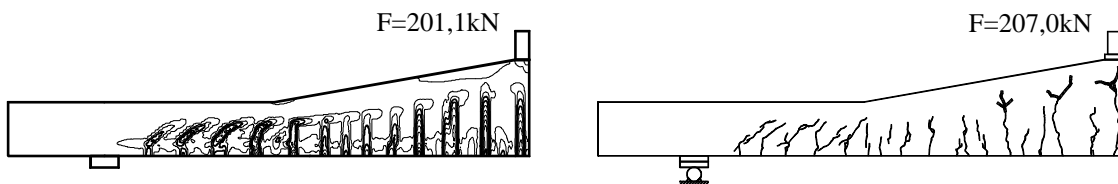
Crack propagation at failure of test beam 5L2 from Non-FEM and test
